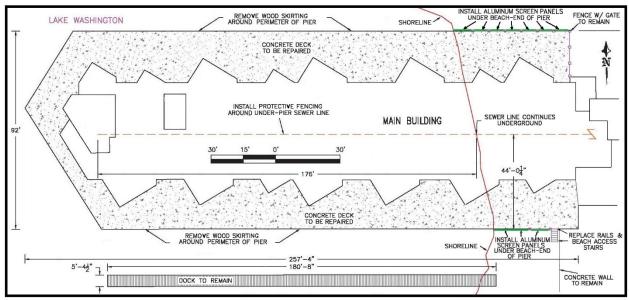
Overhead drawing of the Parkside Apartments HOA pier showing the major project components (Adapted from Sheet 3 of 7 in Waterfront 2021a).
